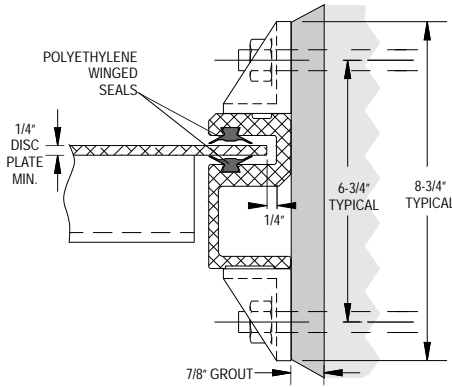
761- Aluminum Flat Frame Mounting; Section AA
